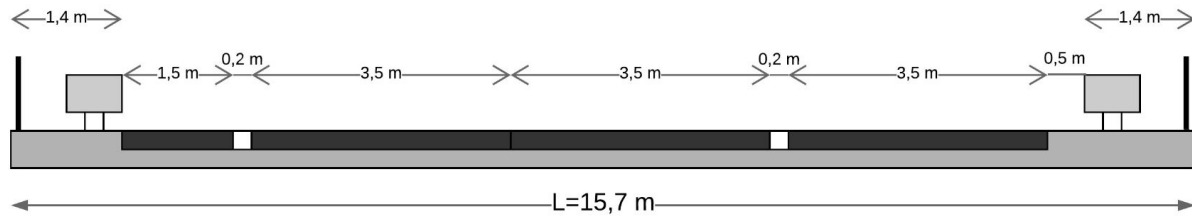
Cross-section of the deck set-up with a width of 15,7 meters based on two driving lanes and a safety lane.
